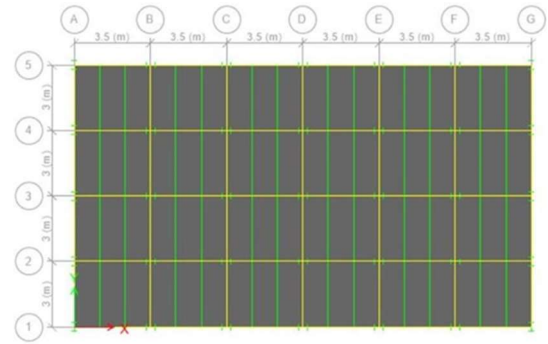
Typical Floor Plan for both 4- and 8- storey Buildings
